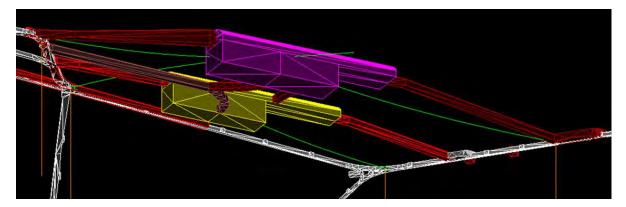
Isometric Drawing of LBNE Cavern Complex, View From Below Looking Northeast (drawing provided by ARUP)
